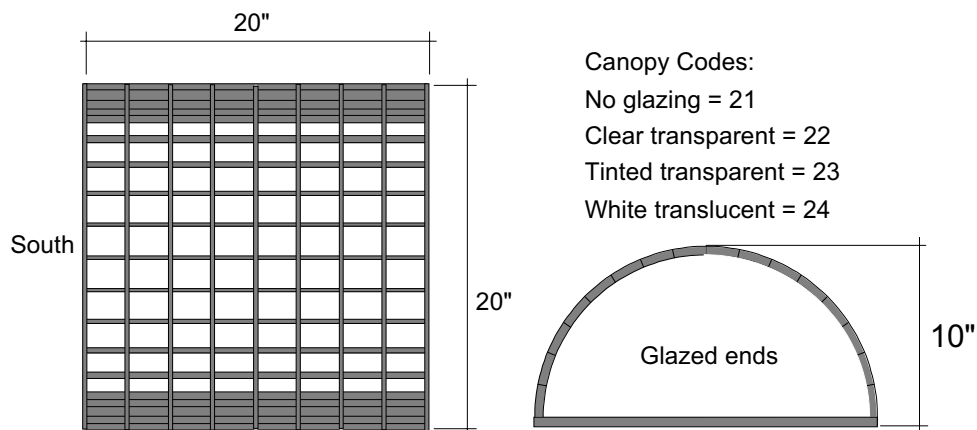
Top View and Front Elevation of Barrel Vault Skylight
